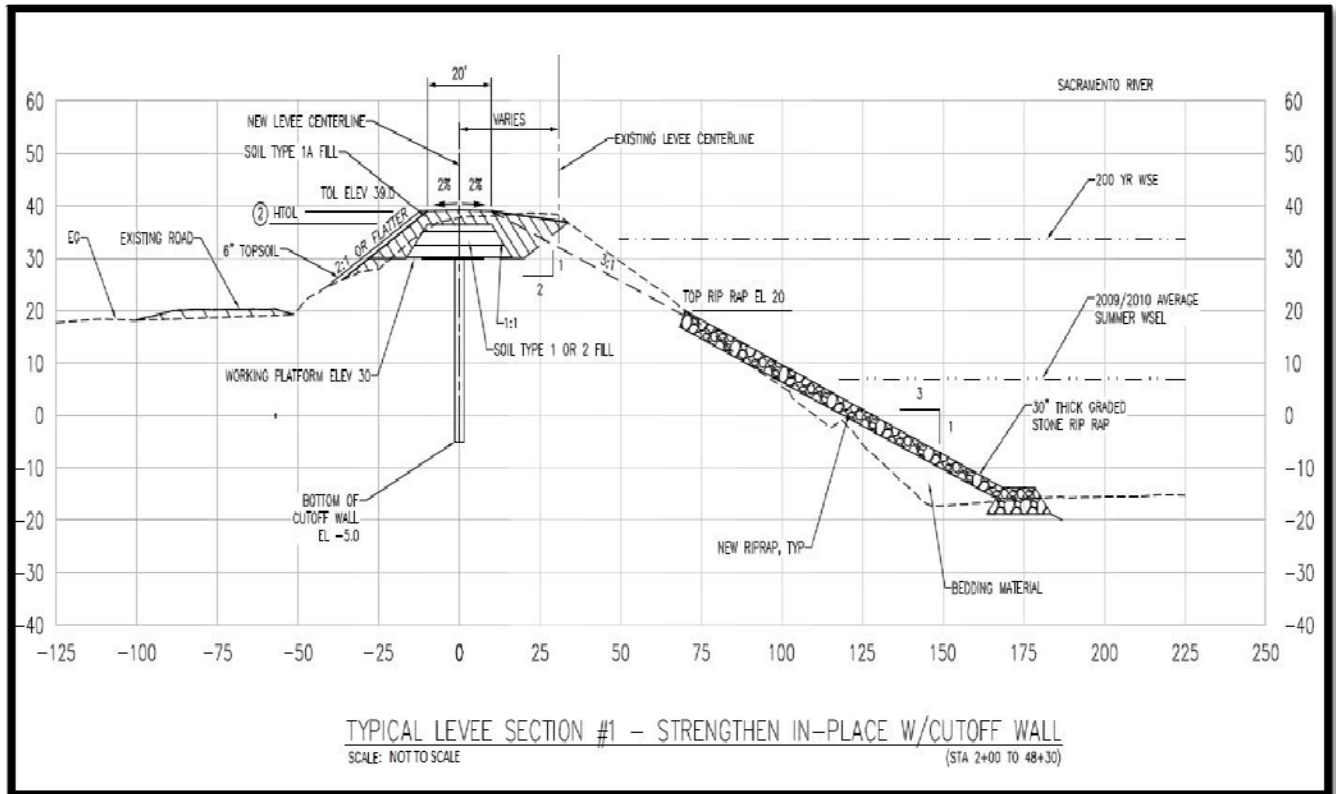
Typical Cross Section Strengthen In-Place with Cutoff wall
